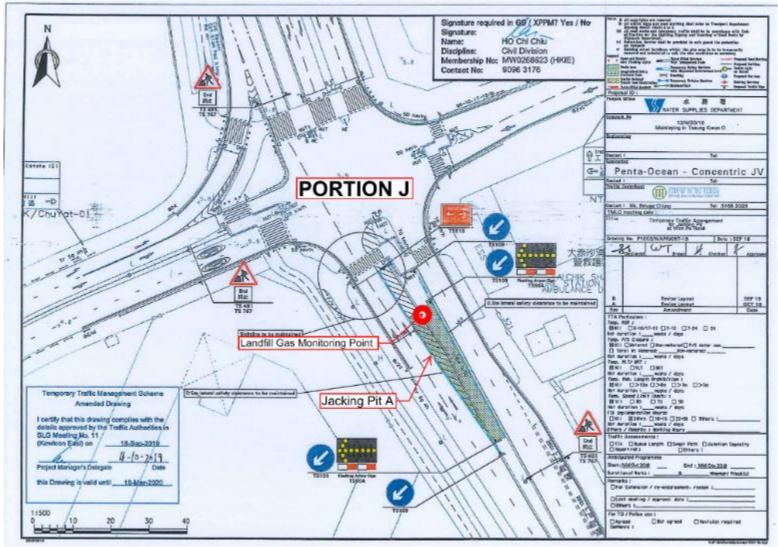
Location Plan for Portion J – CH. A13+50 to CH.A 14+00 (Pit A)
